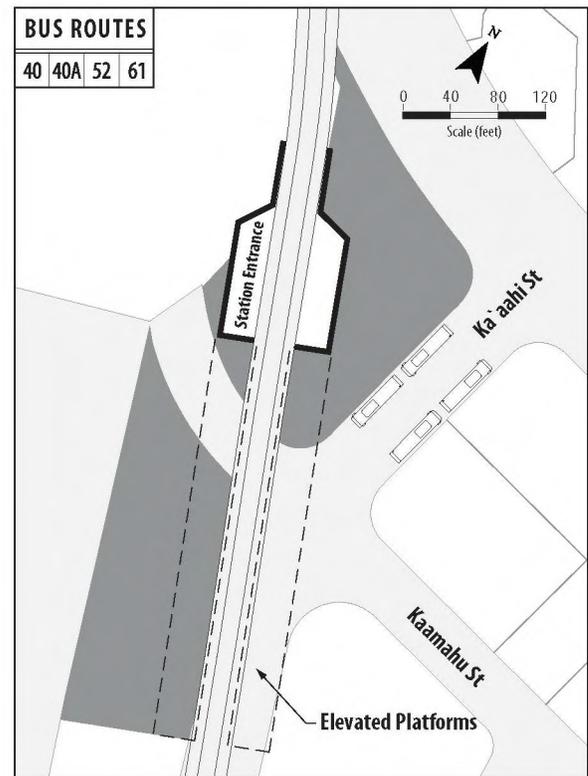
Middle Street Transit Center Station (All Build Alternatives)
